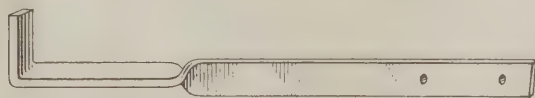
A Tie-Iron or Wall "Dell" for Fastening Floor Joist to the Concrete Block Wall.
